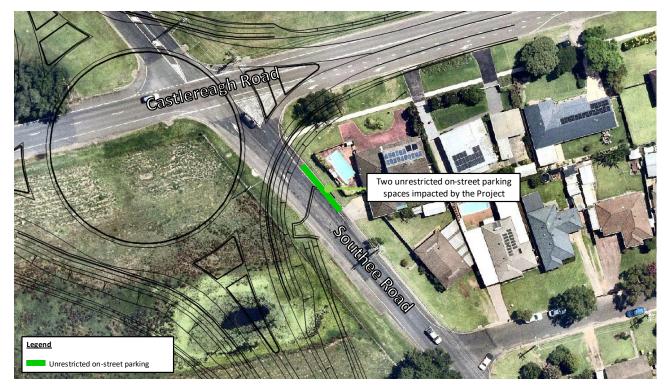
Unrestricted on-street parking spaces along Southee Road impacted by the proposal
